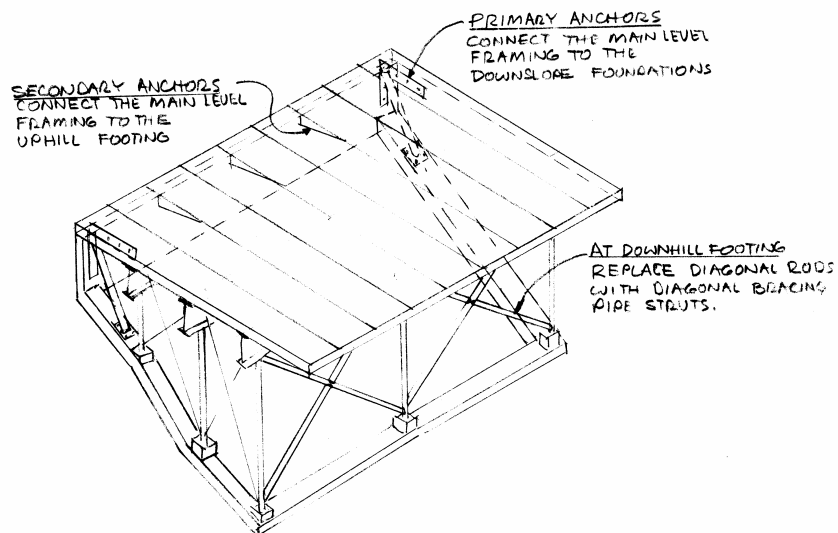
Retrofit anchored bracing system for braced-frame house
